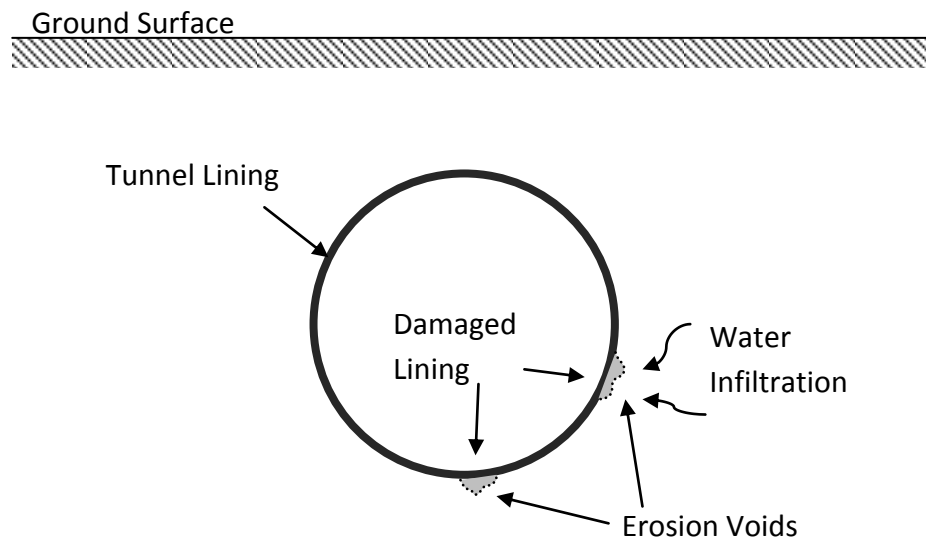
Erosion voids forming at cracks the tunnel lining
